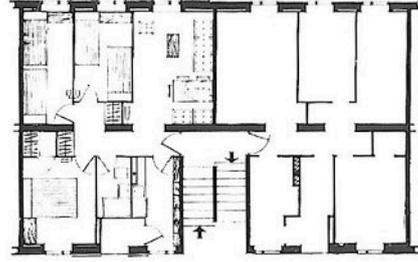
Batán*, 3-bedroom apartments. Floor plan.
